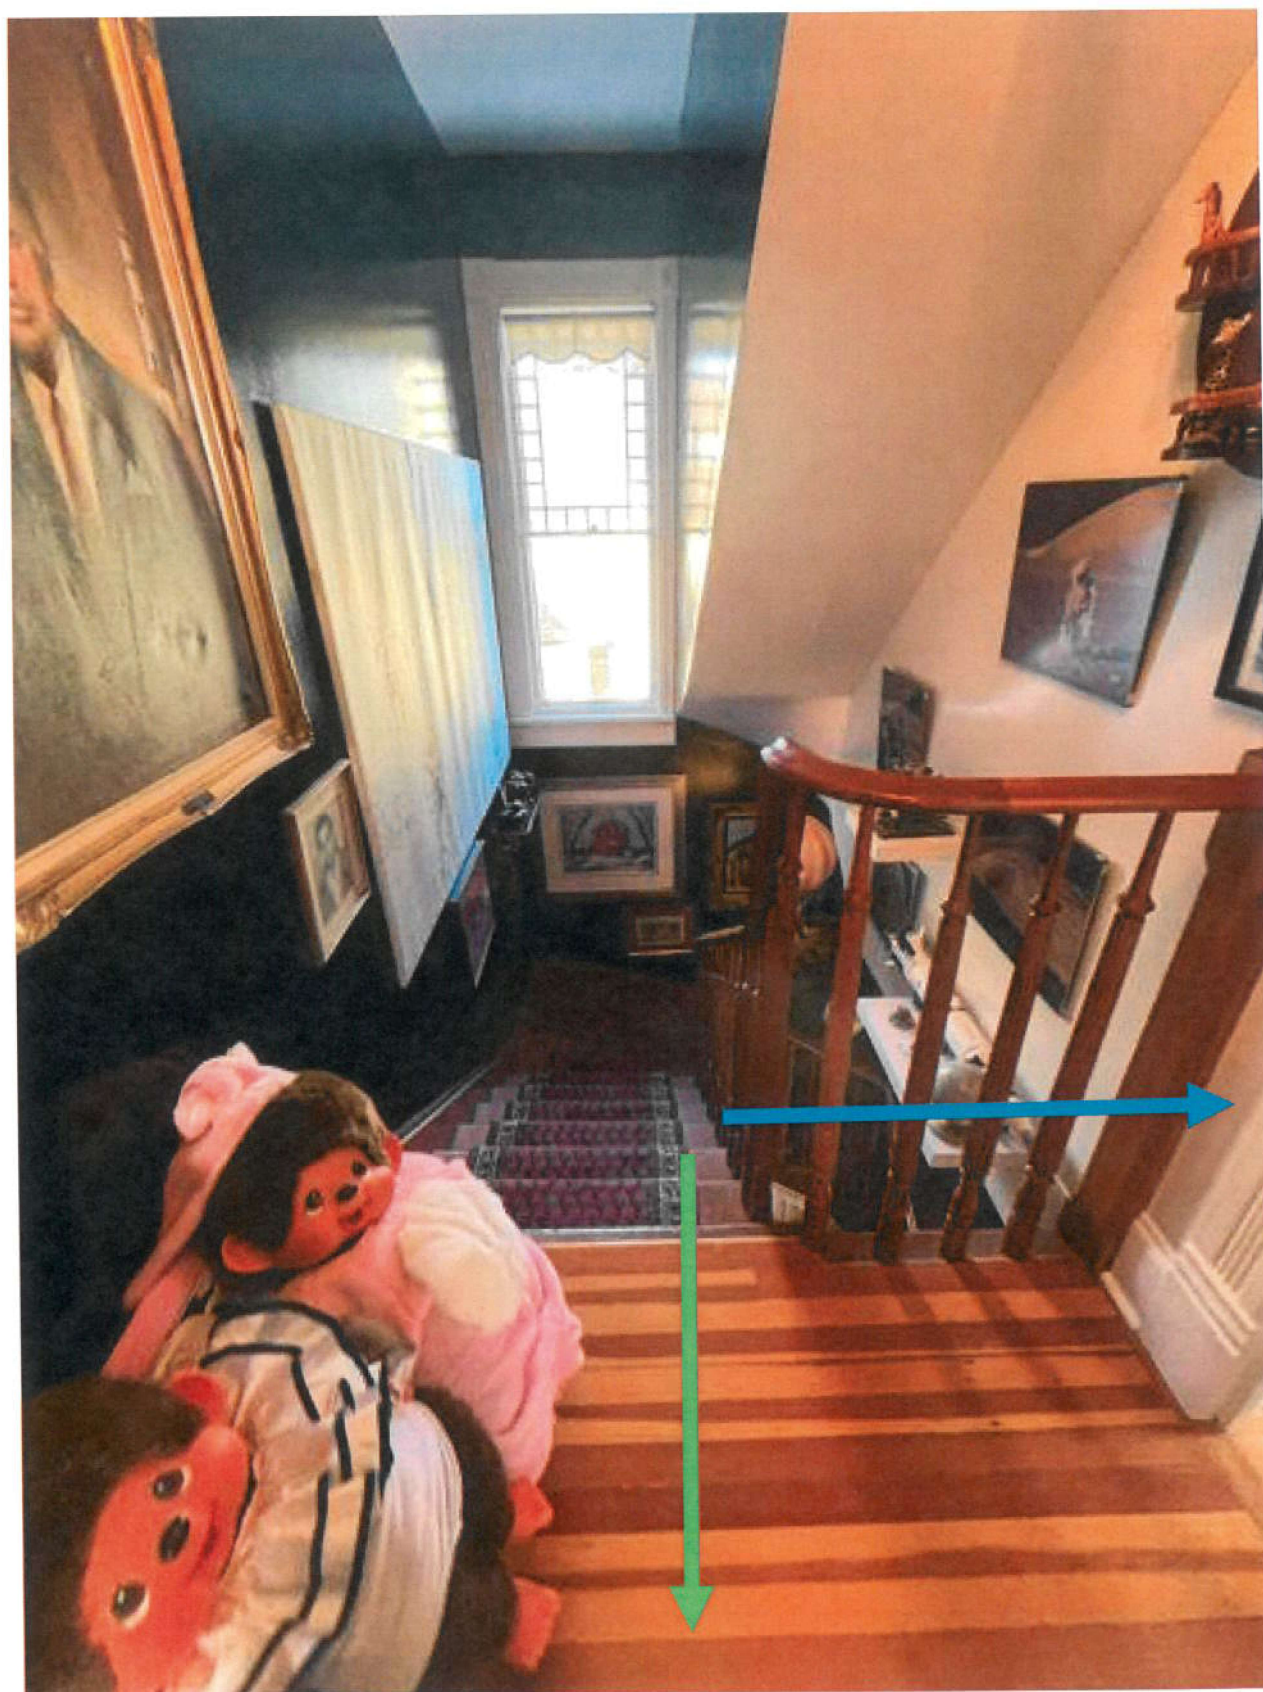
Stairs from main entrance to units # 2 and #5/Attic ('B' on floor plan, see corresponding arrows).
